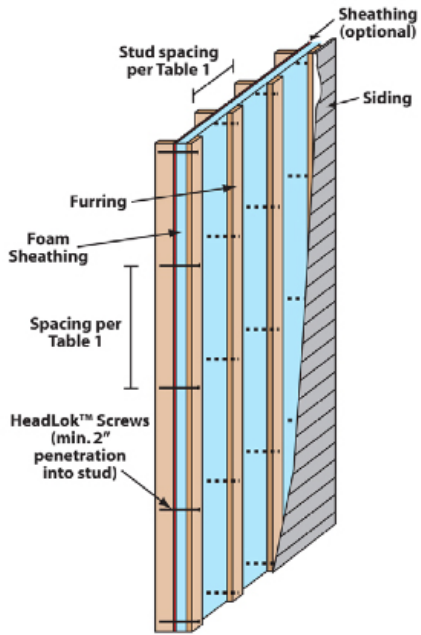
Illustration of Exterior Wall Covering Assembly with Vertically-Oriented Furring
